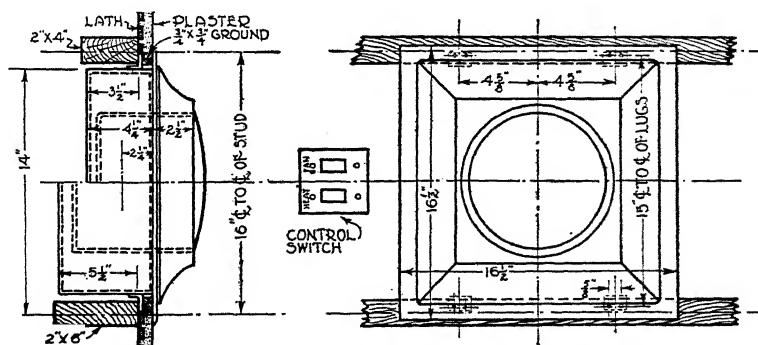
Installation Drawings for Placing Wall-Type Electric Heaters
